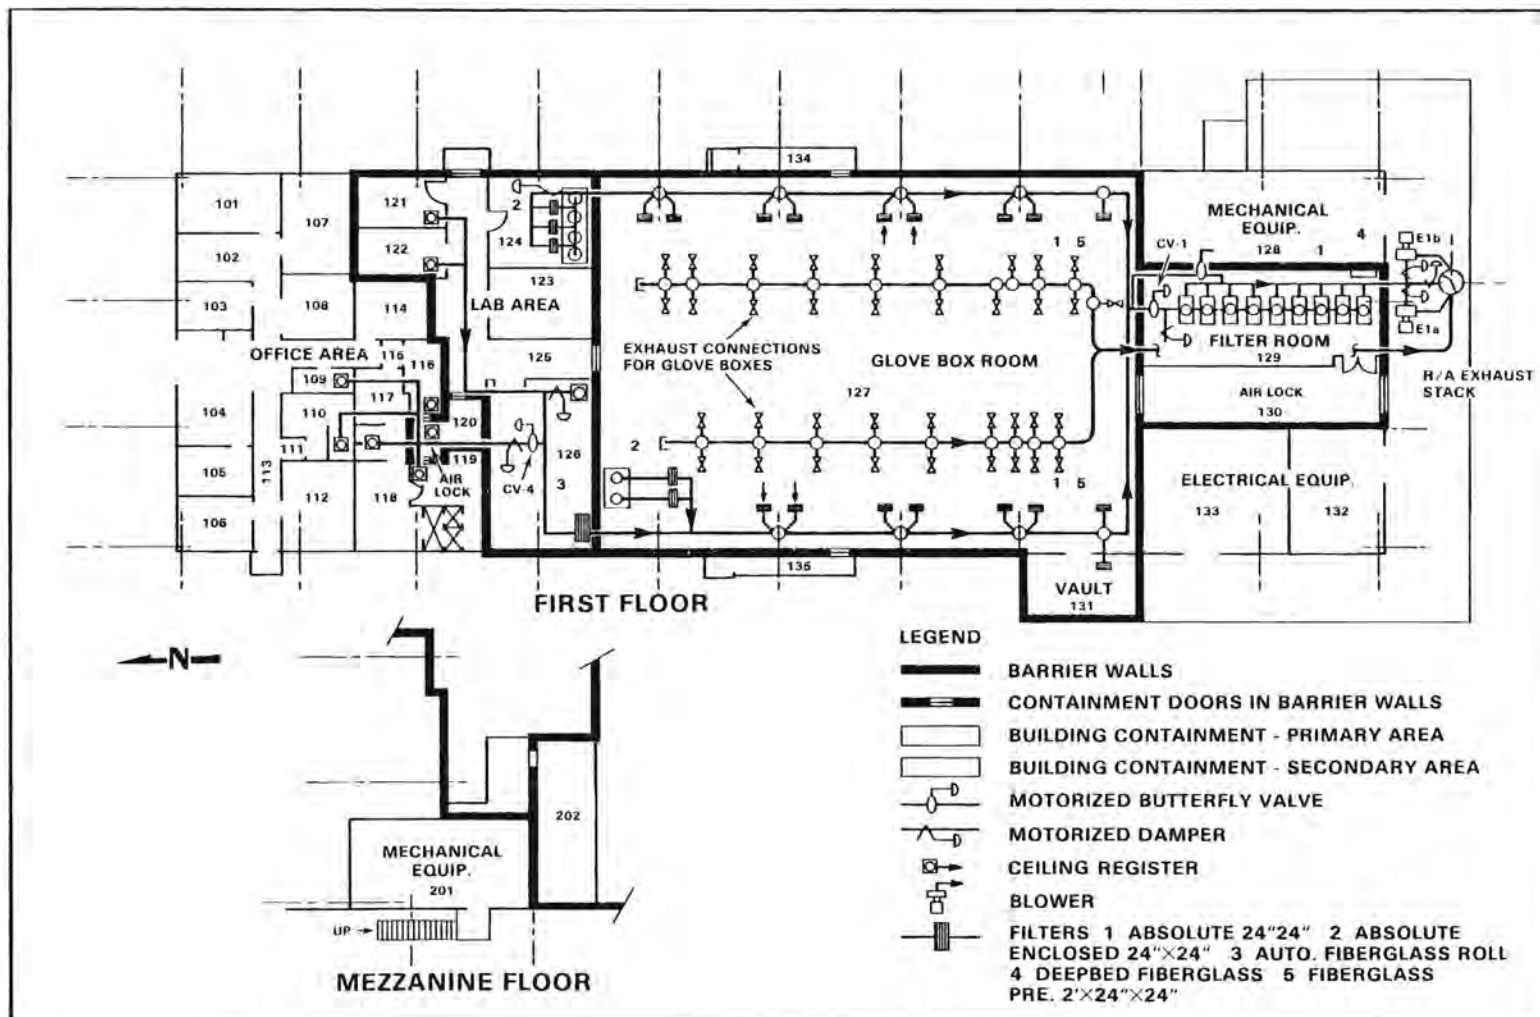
Plan View of NMDF and Schematic of Exhaust System
